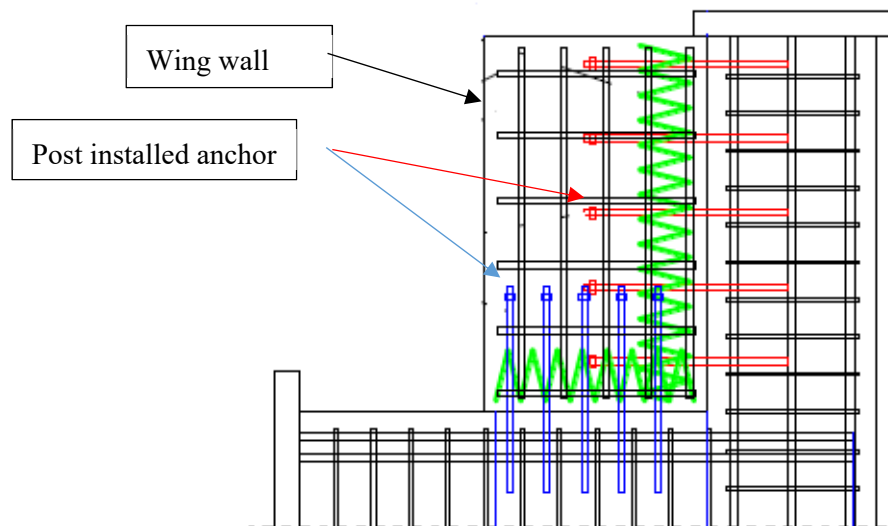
Application of post installed bonded anchor in retrofitting
